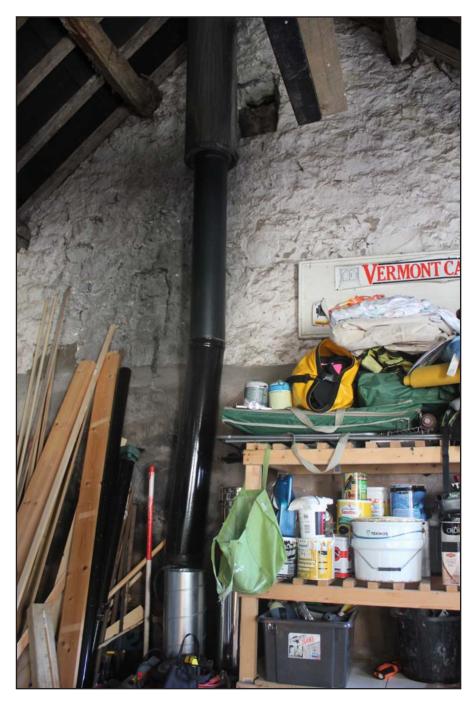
Plas Yn Llan, Cilcain, Flintshire. Internal shot - eastern elevation - from the southwest - 1m scale
